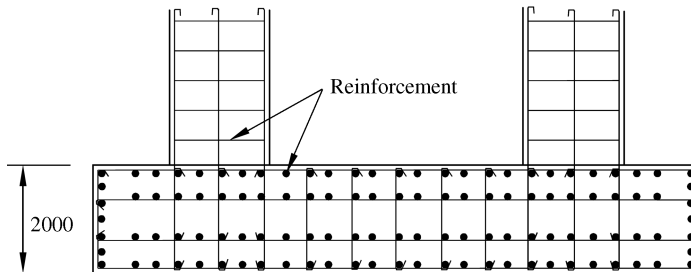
C.1 Typical reinforcement in a base slab of a framed foundation.
